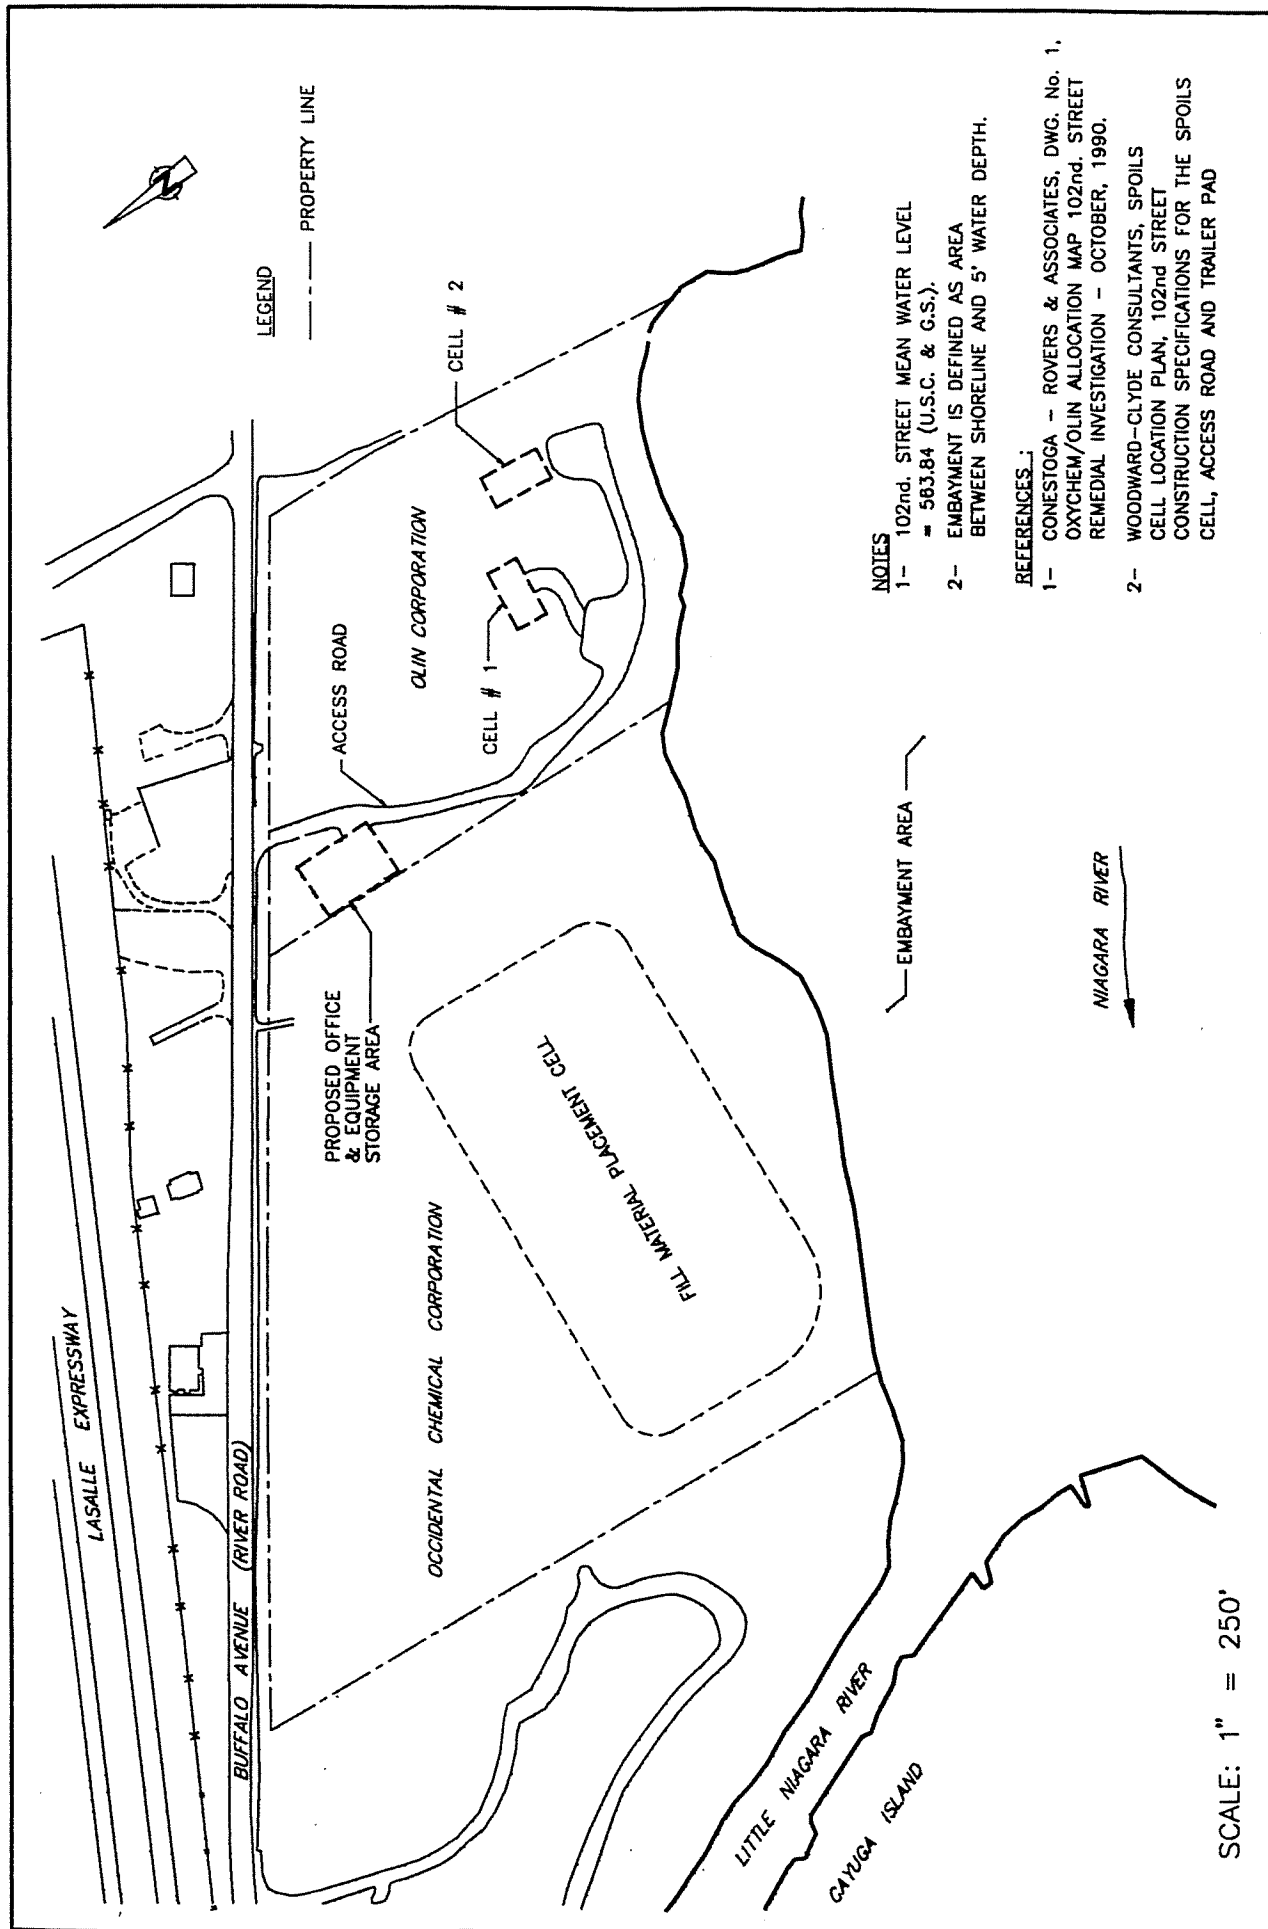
PROPOSED SITE FACILITIES REMEDIAL DESIGN	OXYCHEM/OLIN 102nd Street Landfill Site FLUOR DANIEL
